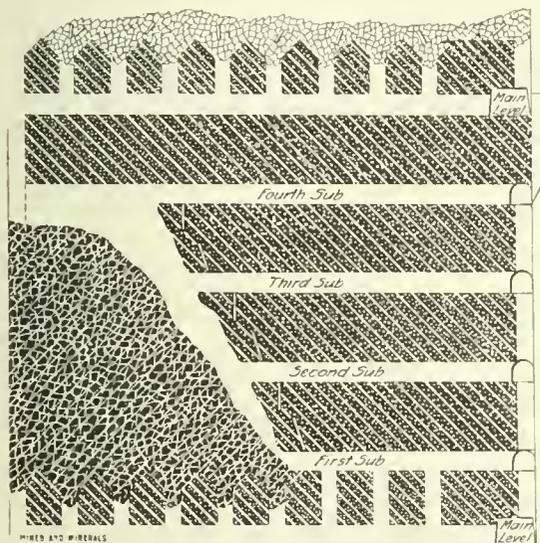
LONGITUDINAL SECTION OF SUBSTOPING
